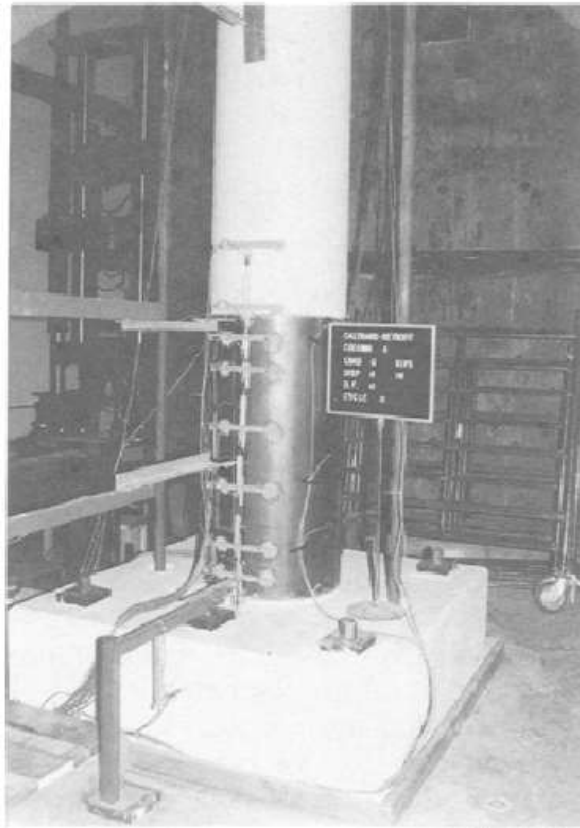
Steel jacket used to retrofit column (courtesy of Chai et al., 1994)
